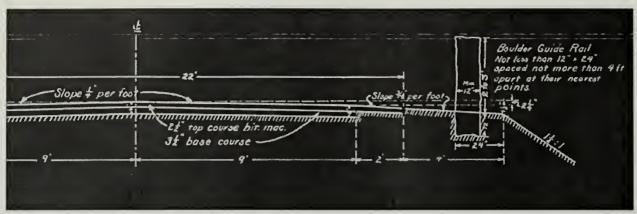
Cross-section for an angular stone guardwall on Cadillac Mountain Road, 1931. (U.S. Department of Agriculture, Bureau of Public Roads, Project 1, Sheet 4 of 11, 1931)
